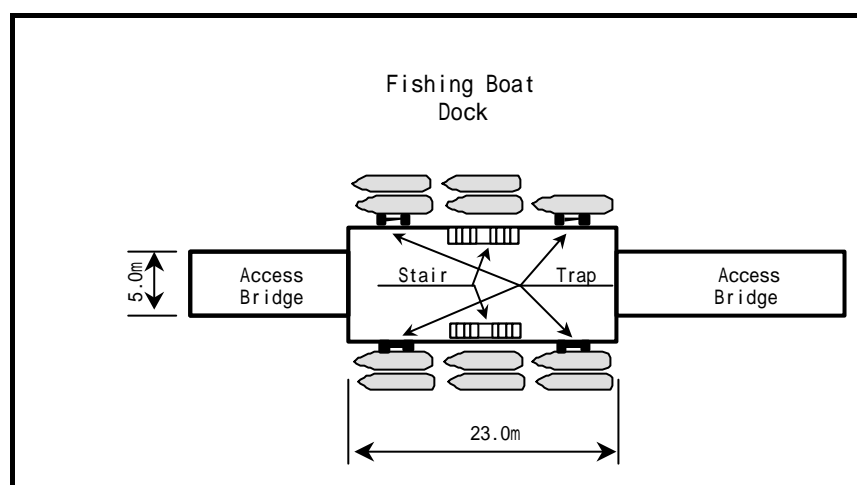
Schematic Layout of Fishing Boat Dock
